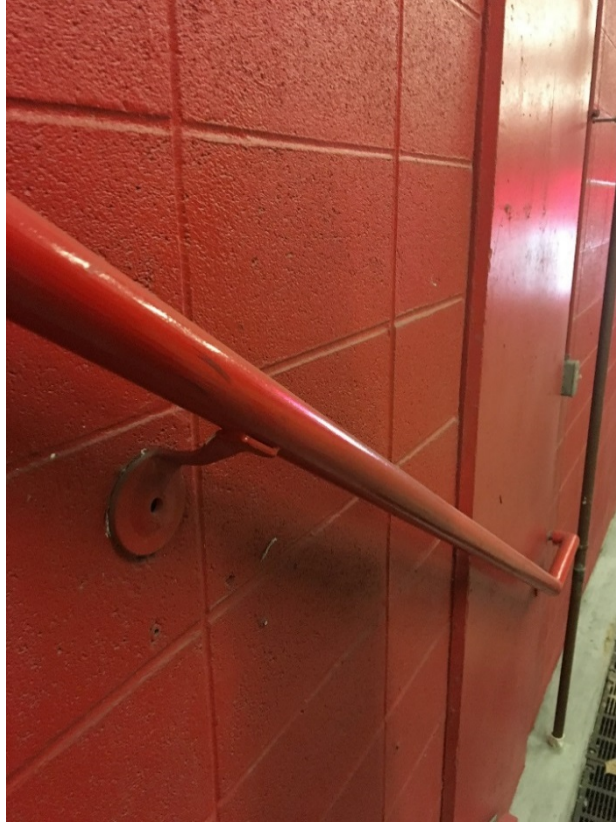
Loose Handrail at Service Level Field Access Tunnel Stair.
